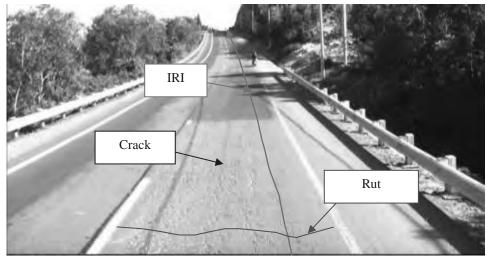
Pavement damage to be evaluated by PCS
